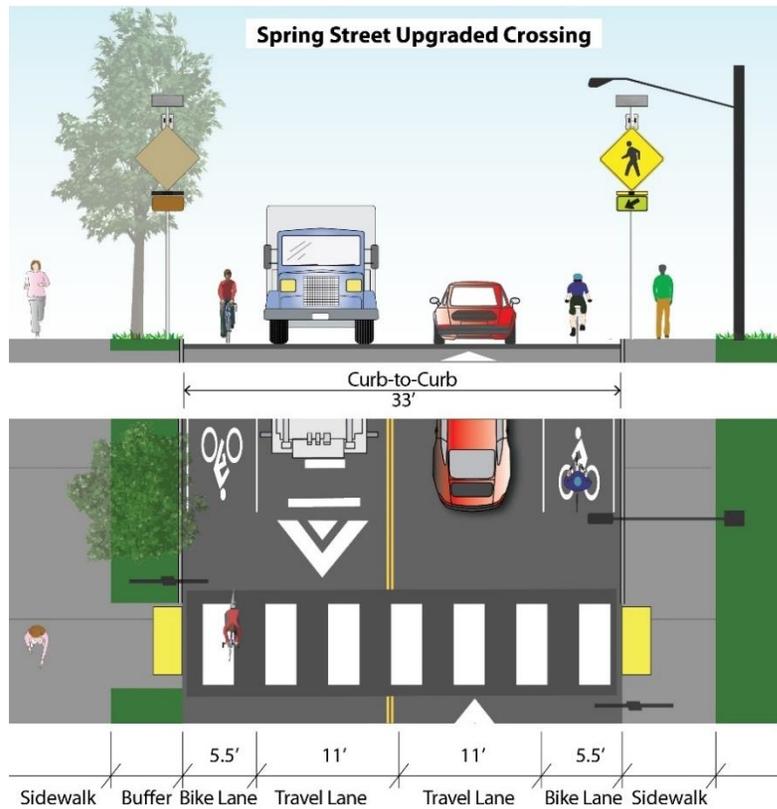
Upgraded Crosswalk with Rectangular Rapid Flashing Beacon on Broadway at Spring Street
